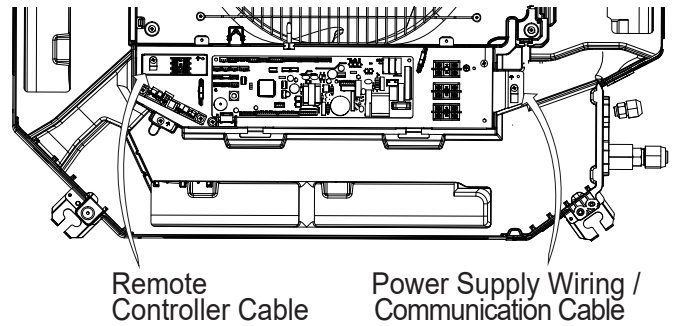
TQ / TR Frame Four-Way Cassette Wiring / Cable Routing, Side View.
